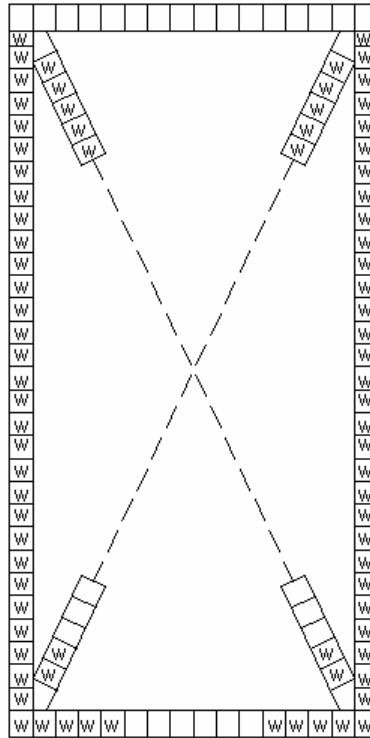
Sheathing nail failure modes for Wall A3.
